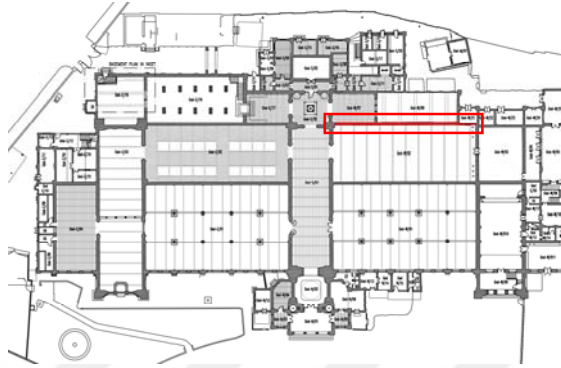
Key Plan showing wall Gnd-W/02-S-W
